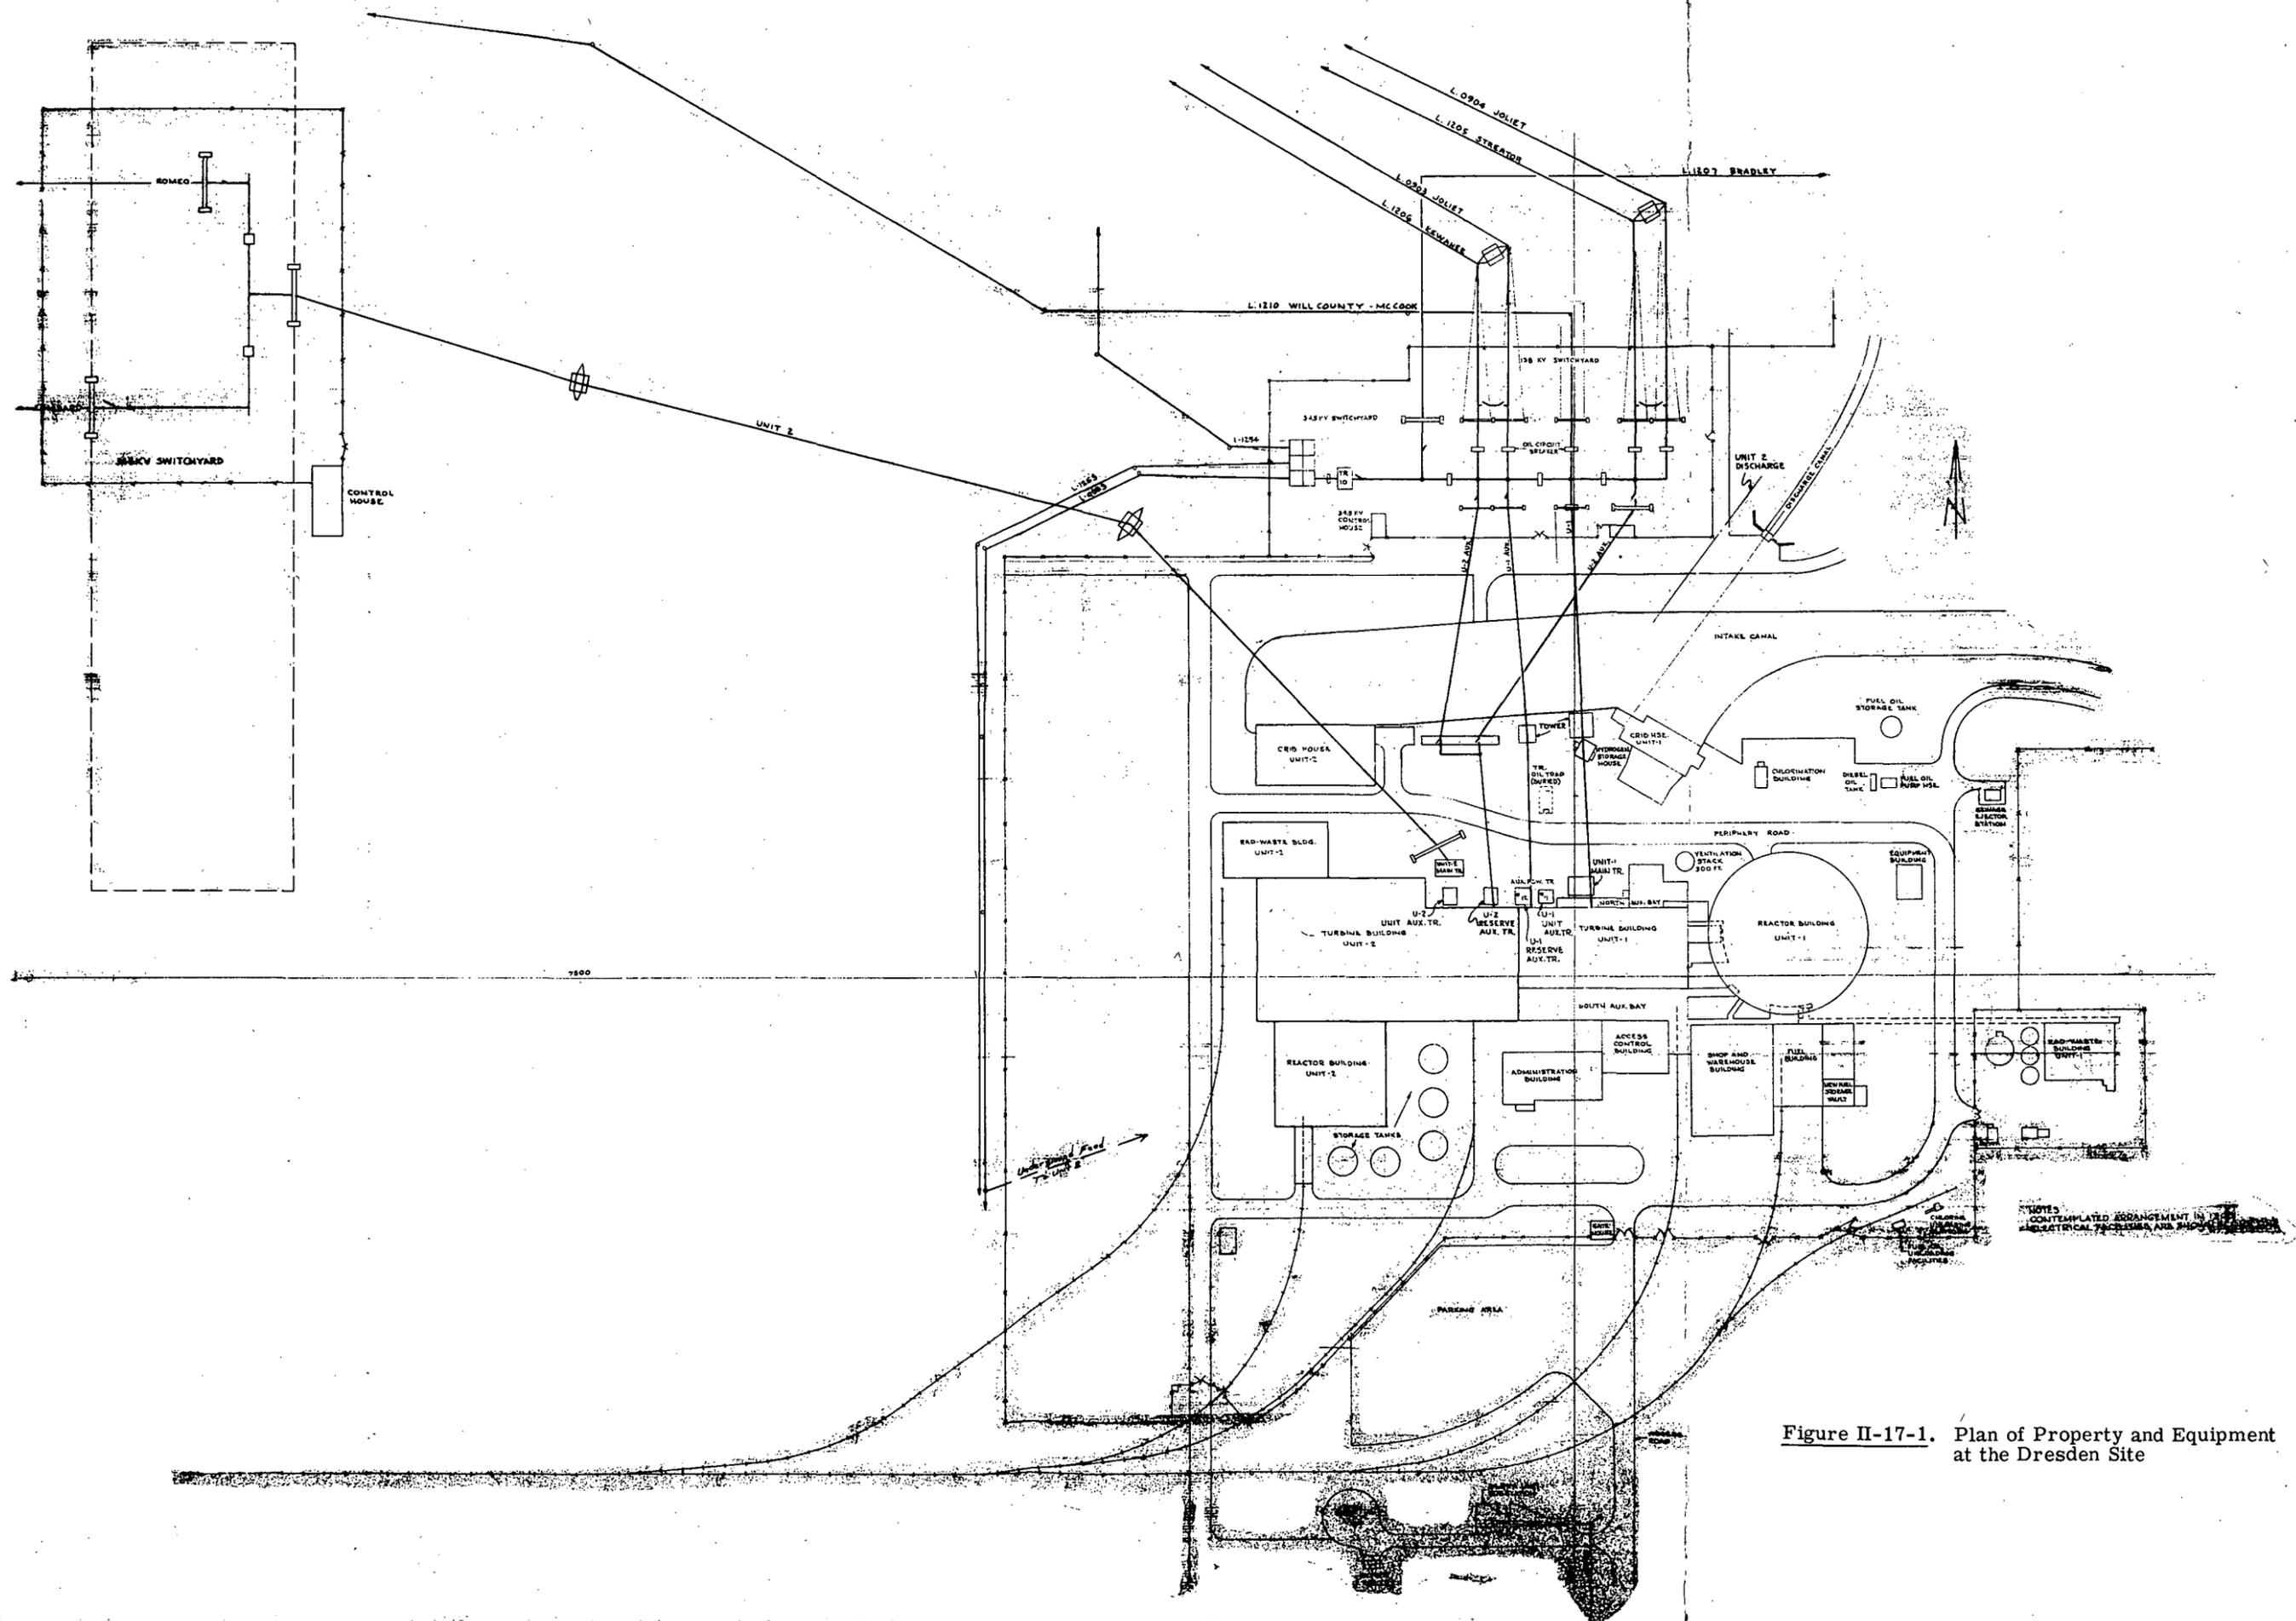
Plan of Property and Equipment at the Dresden Site
